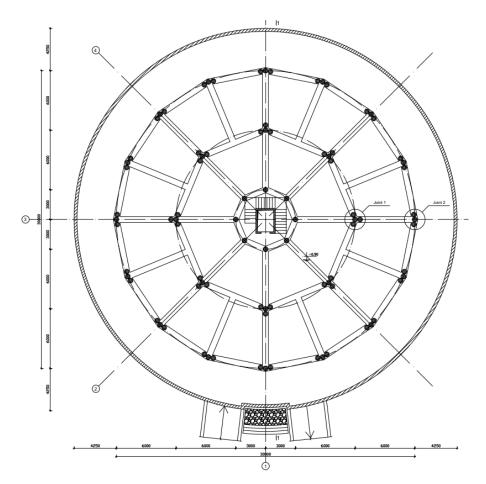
Plan of location of 88 seismic isolators at the mark -0.90 in the basement (parking) floor
